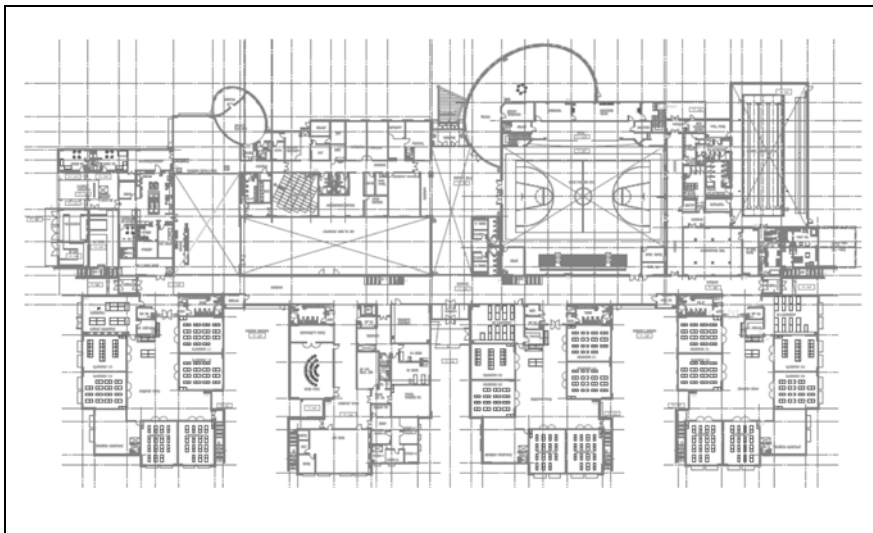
Ground Floor Plan Thumbnail of Building-4
